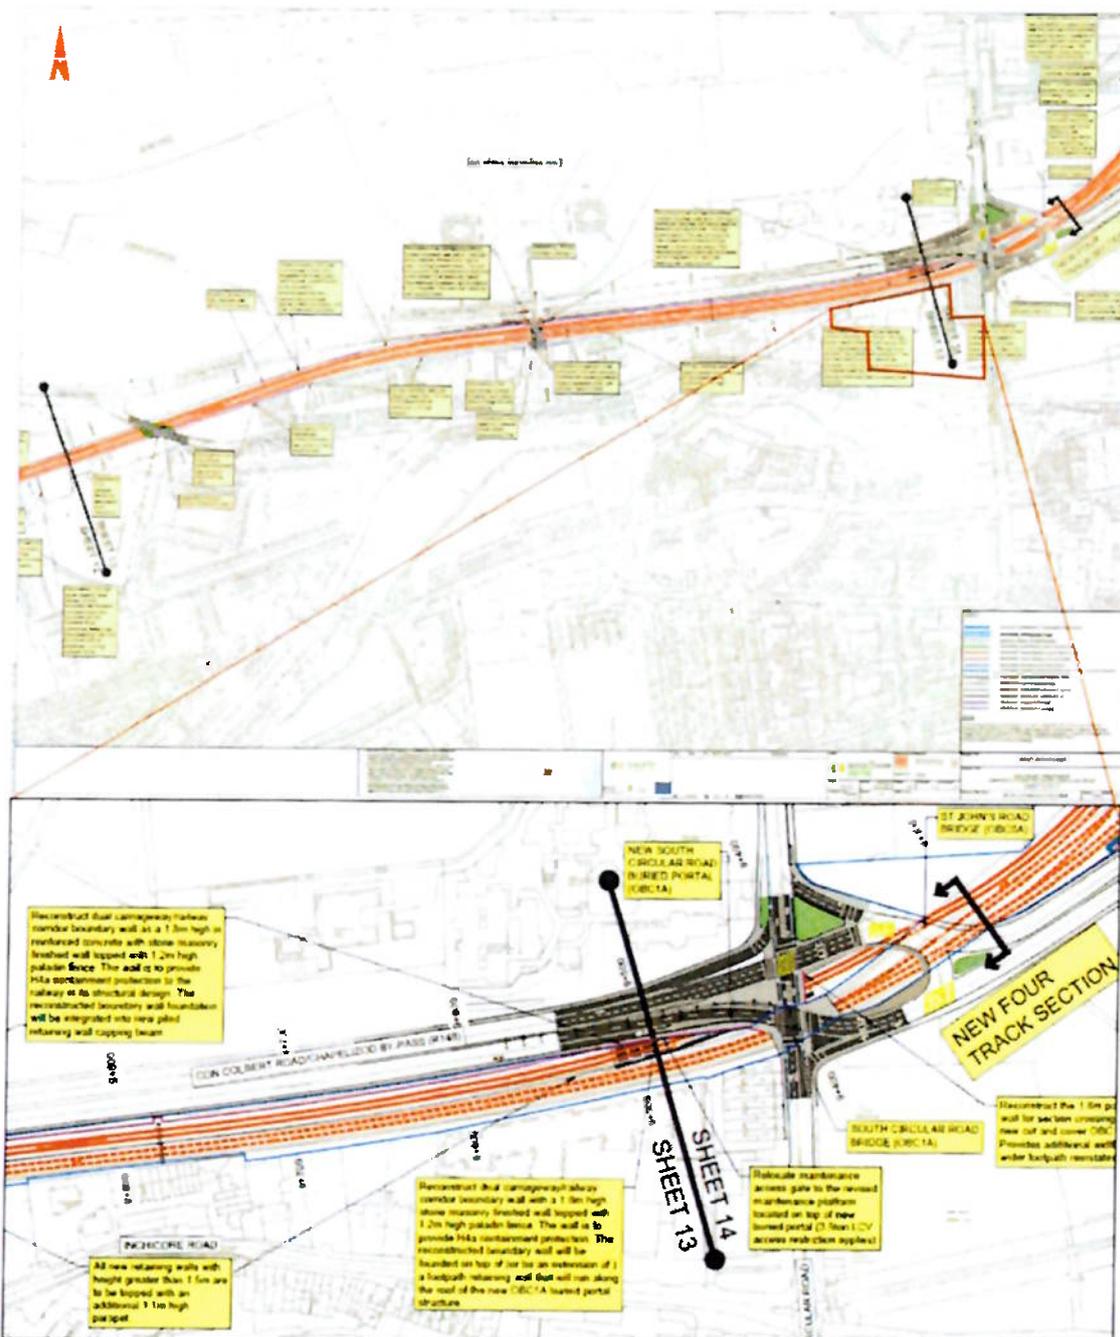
Structures Plan for the section of the railway adjacent to the subject property (drawing DP-04-23-DWG-RO-TTA-18898)
